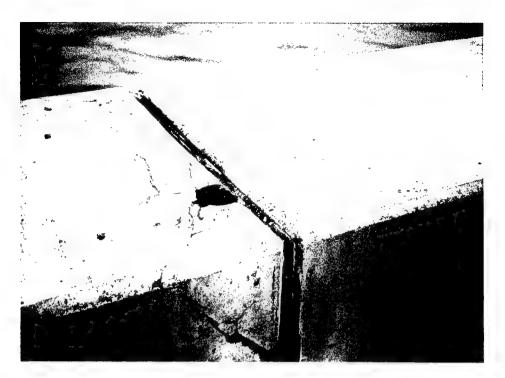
Cracking at joint 9/10, north seawall monolith N10
